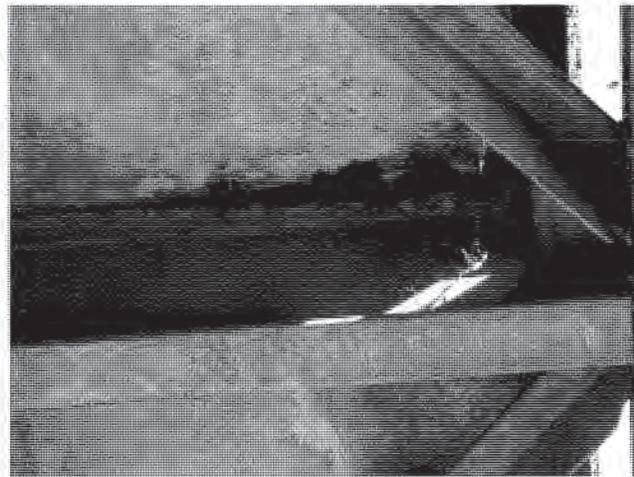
shows the pack rust that is common at the joint between the floor beams and the concrete deck.
